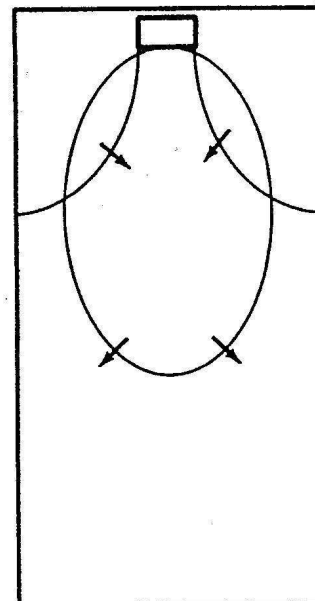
CENTERED PLACEMENT - SHORT WALL
